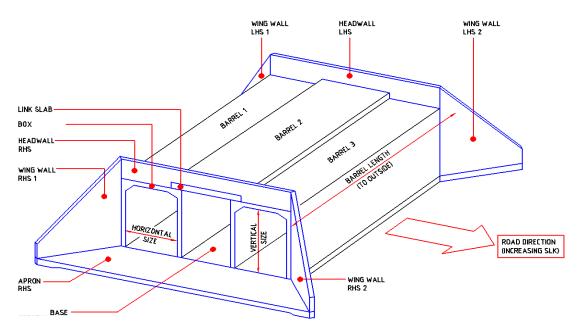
B – 3D PRECAST BOX AND LINK SLAB BRIDGE
